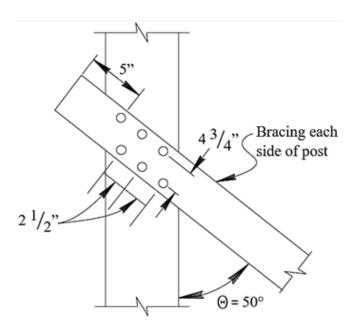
Post and Double Brace with Multiple Fasteners
